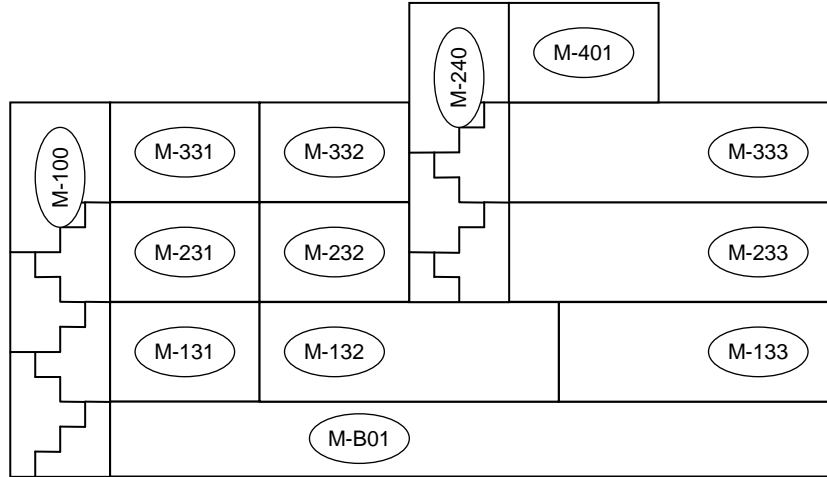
Room Numbering on Drawings – Plan View
